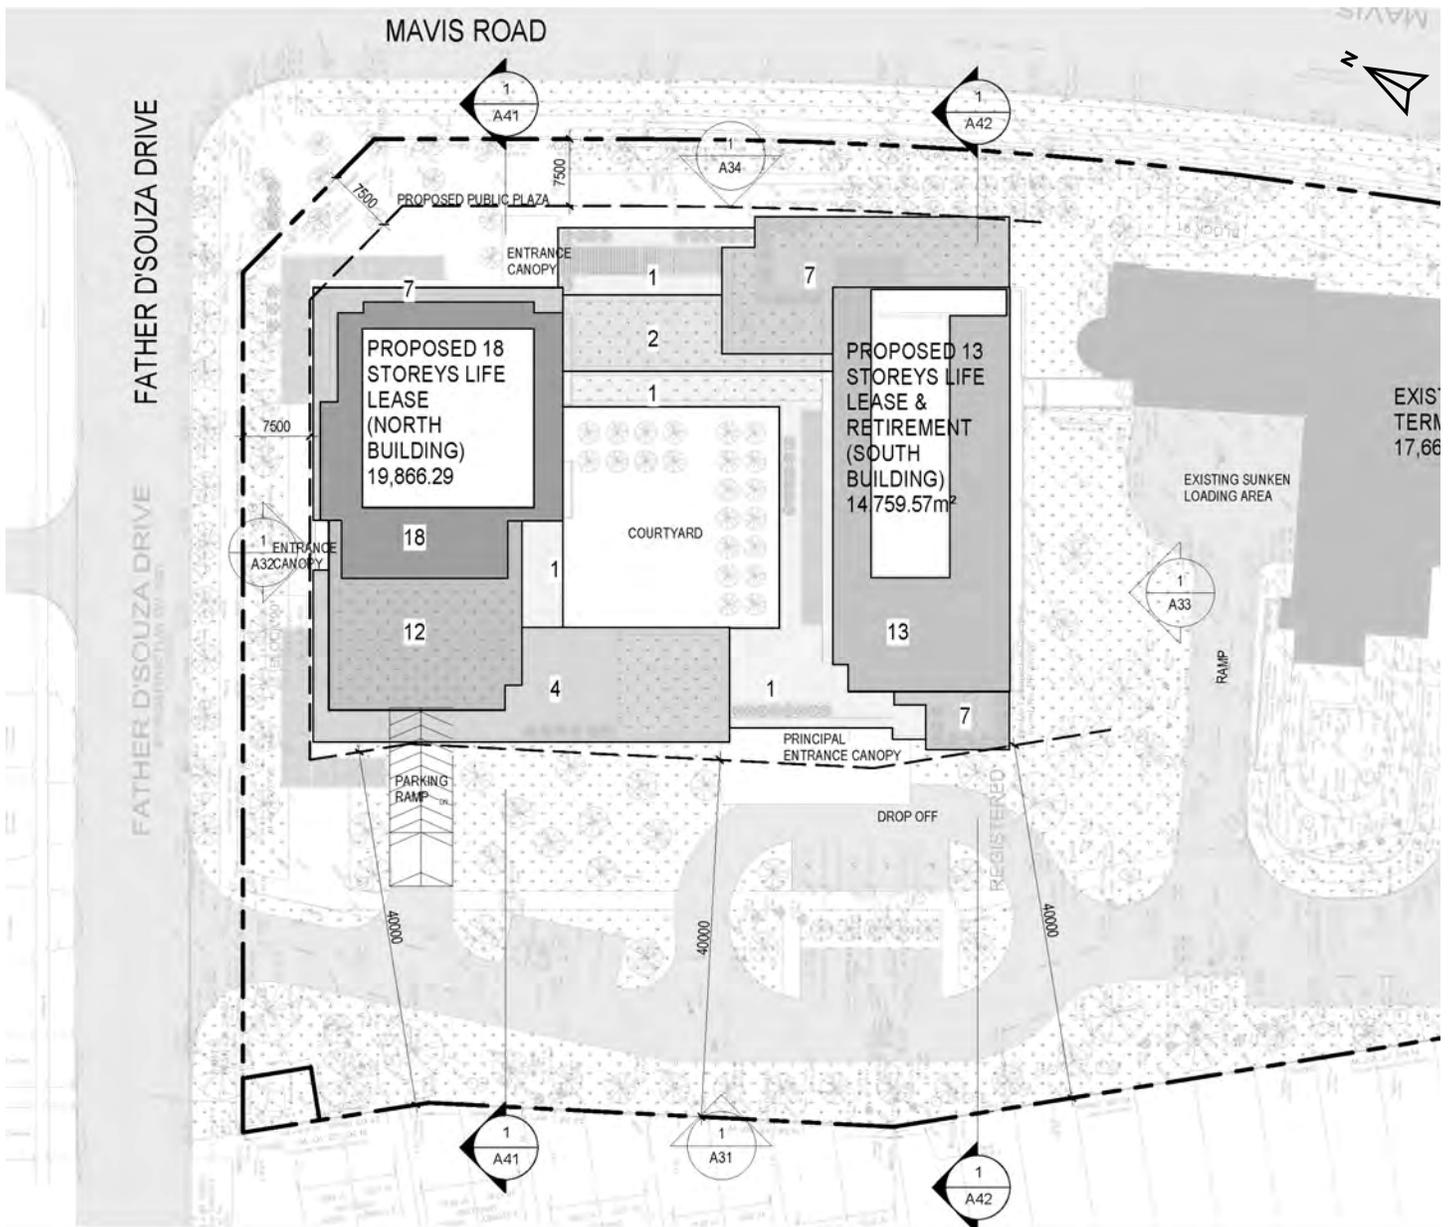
OFFICIAL PLAN AMENDMENT ARCHITECTURAL DRAWINGS (SITE PLAN)
